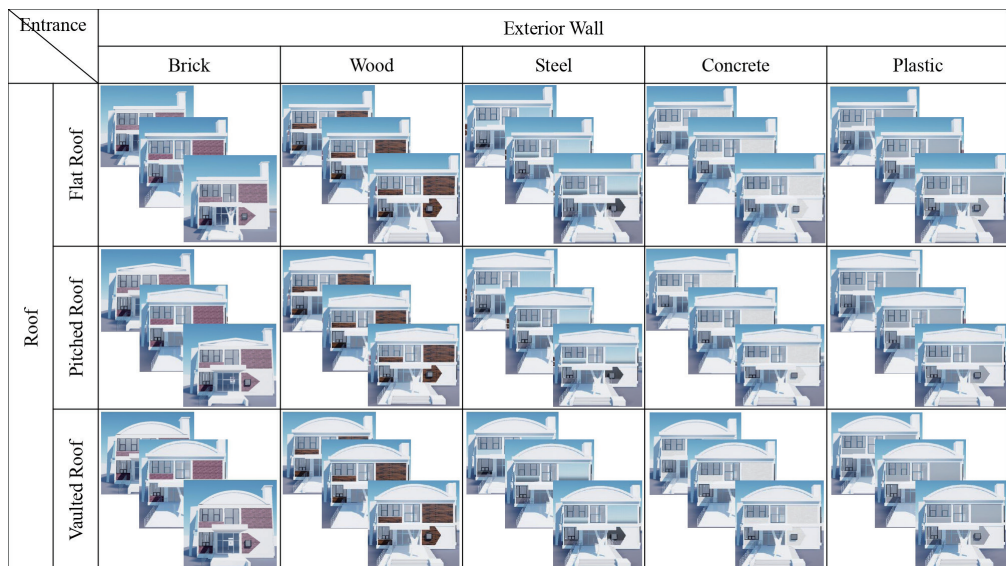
VR Scenes of the Existing System at Test 3 with Roof(3), External Wall(5), and Entrance(3) Alternatives
